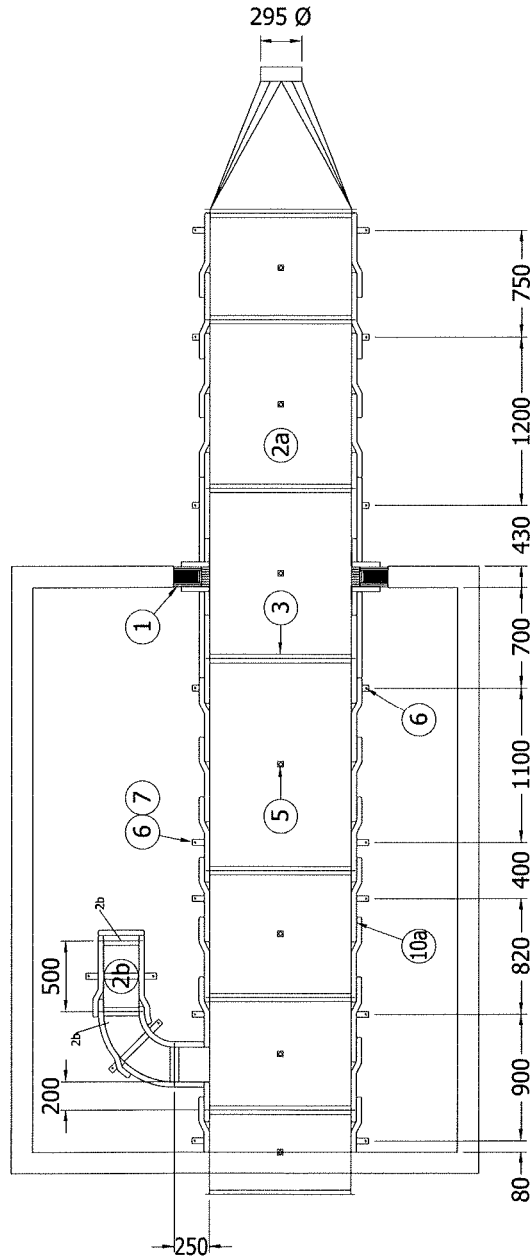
Typical Plan View of Horizontal Assembly
